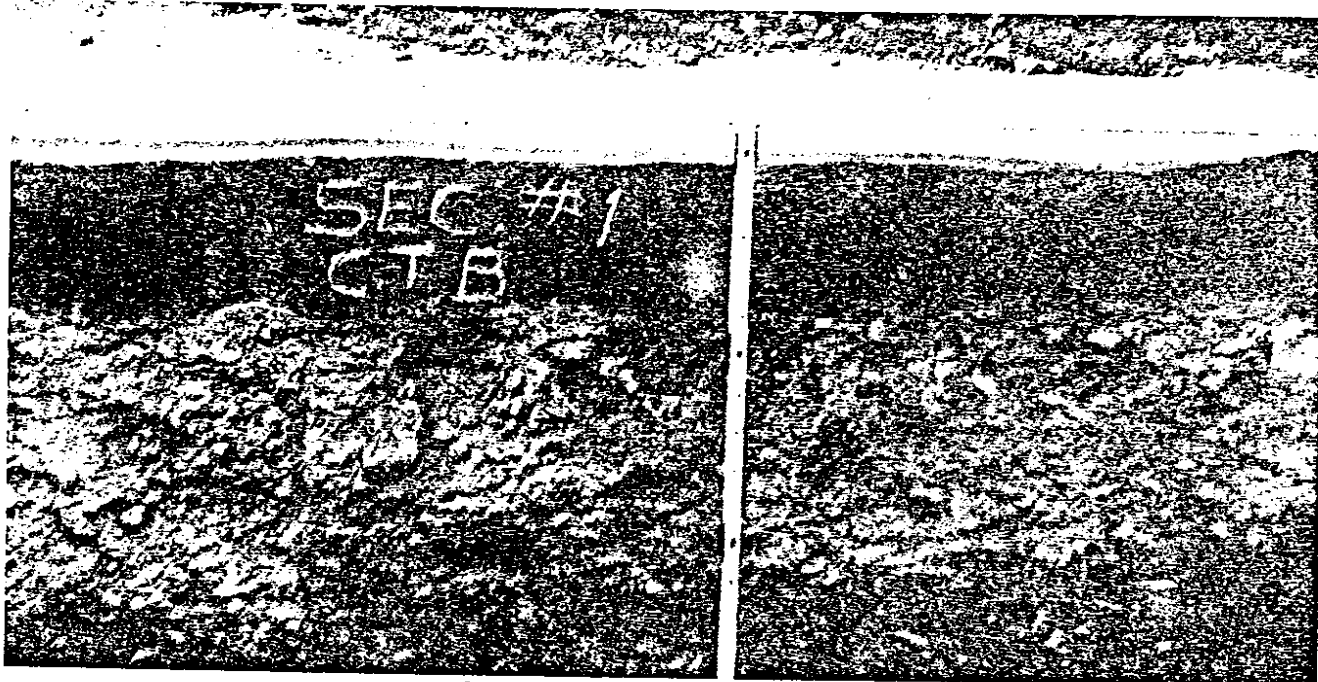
SECTION 1, CTB, CROSS-SECTION.
